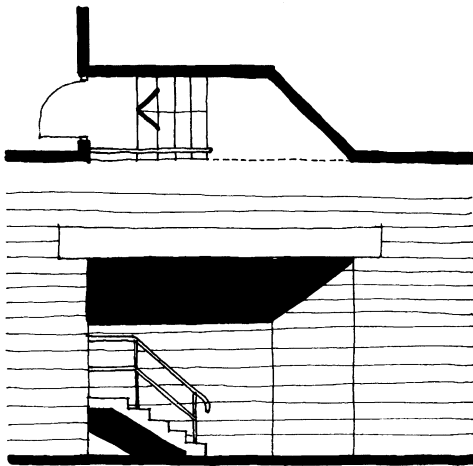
'Sub-space' off circulation route, plan/elevation.
